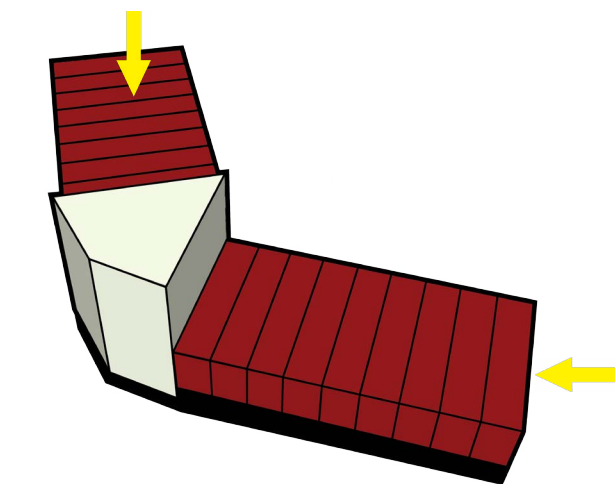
Division. Individual living units per floor to allow a modular layout in plan.
